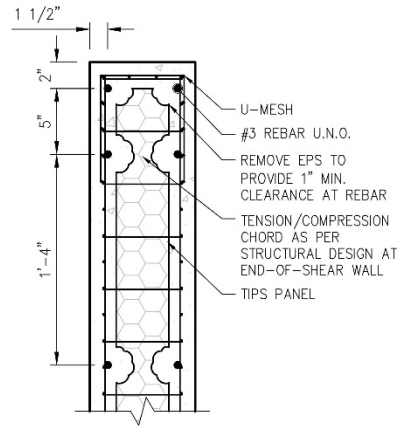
NON-DESIGNATED SHEAR WALL SECTION VIEW
